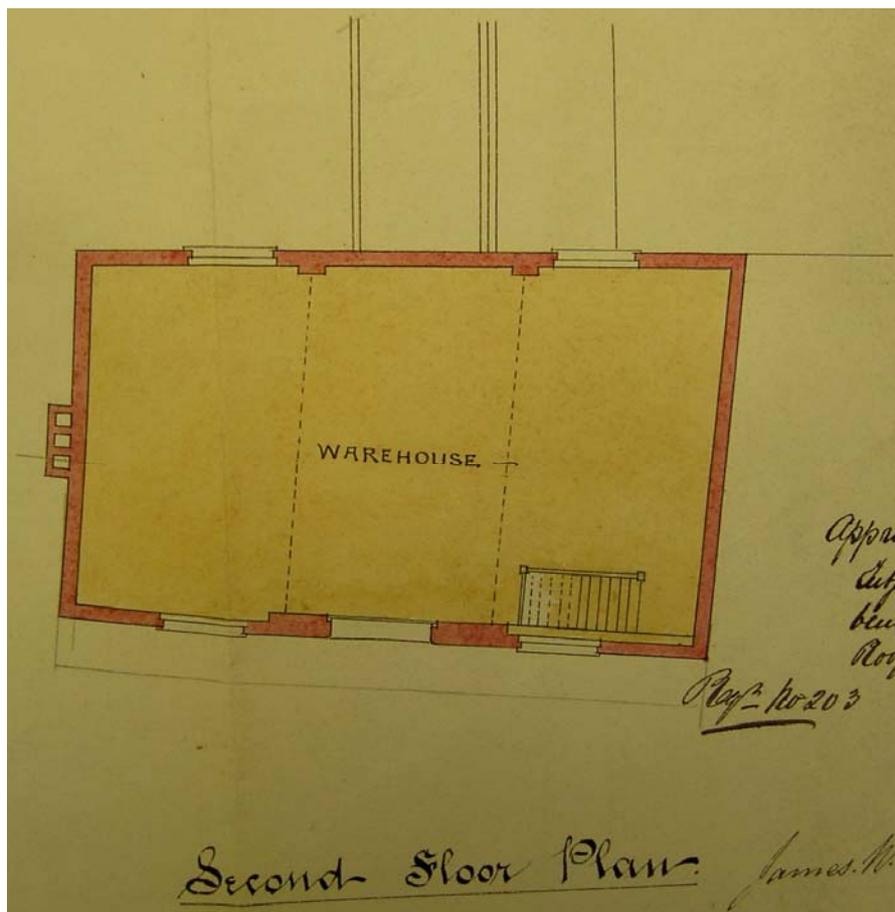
Second floor plan of proposed warehouse (CRO(B) Z1392 1877)
